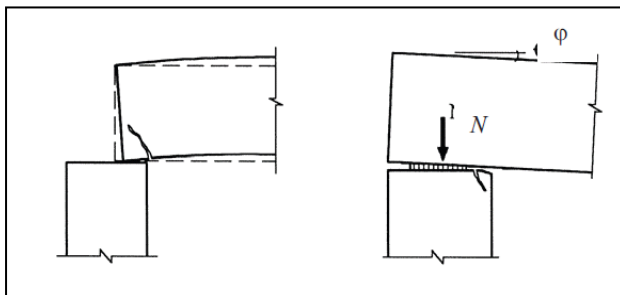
Example of damages at connection zones (FIB - Féd. Int. du Béton 2002)
